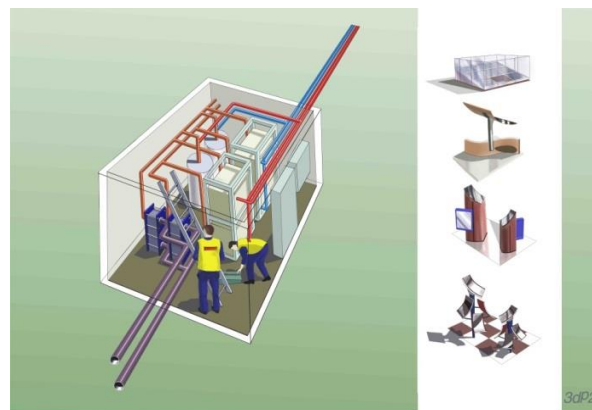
Collective decentral heat pump station in underground basement for local area grid
